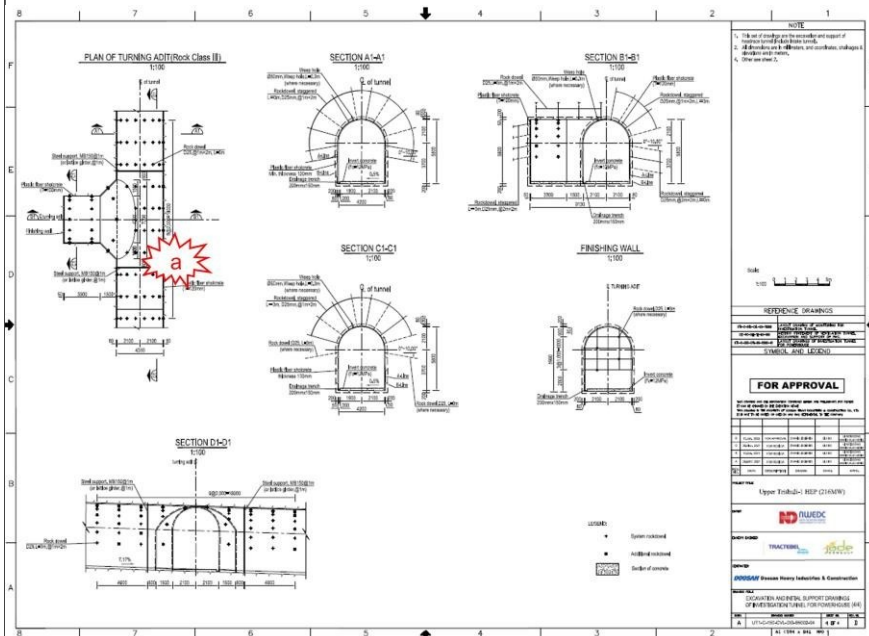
C-385-CVL-DG-65002-03, Rev. D
